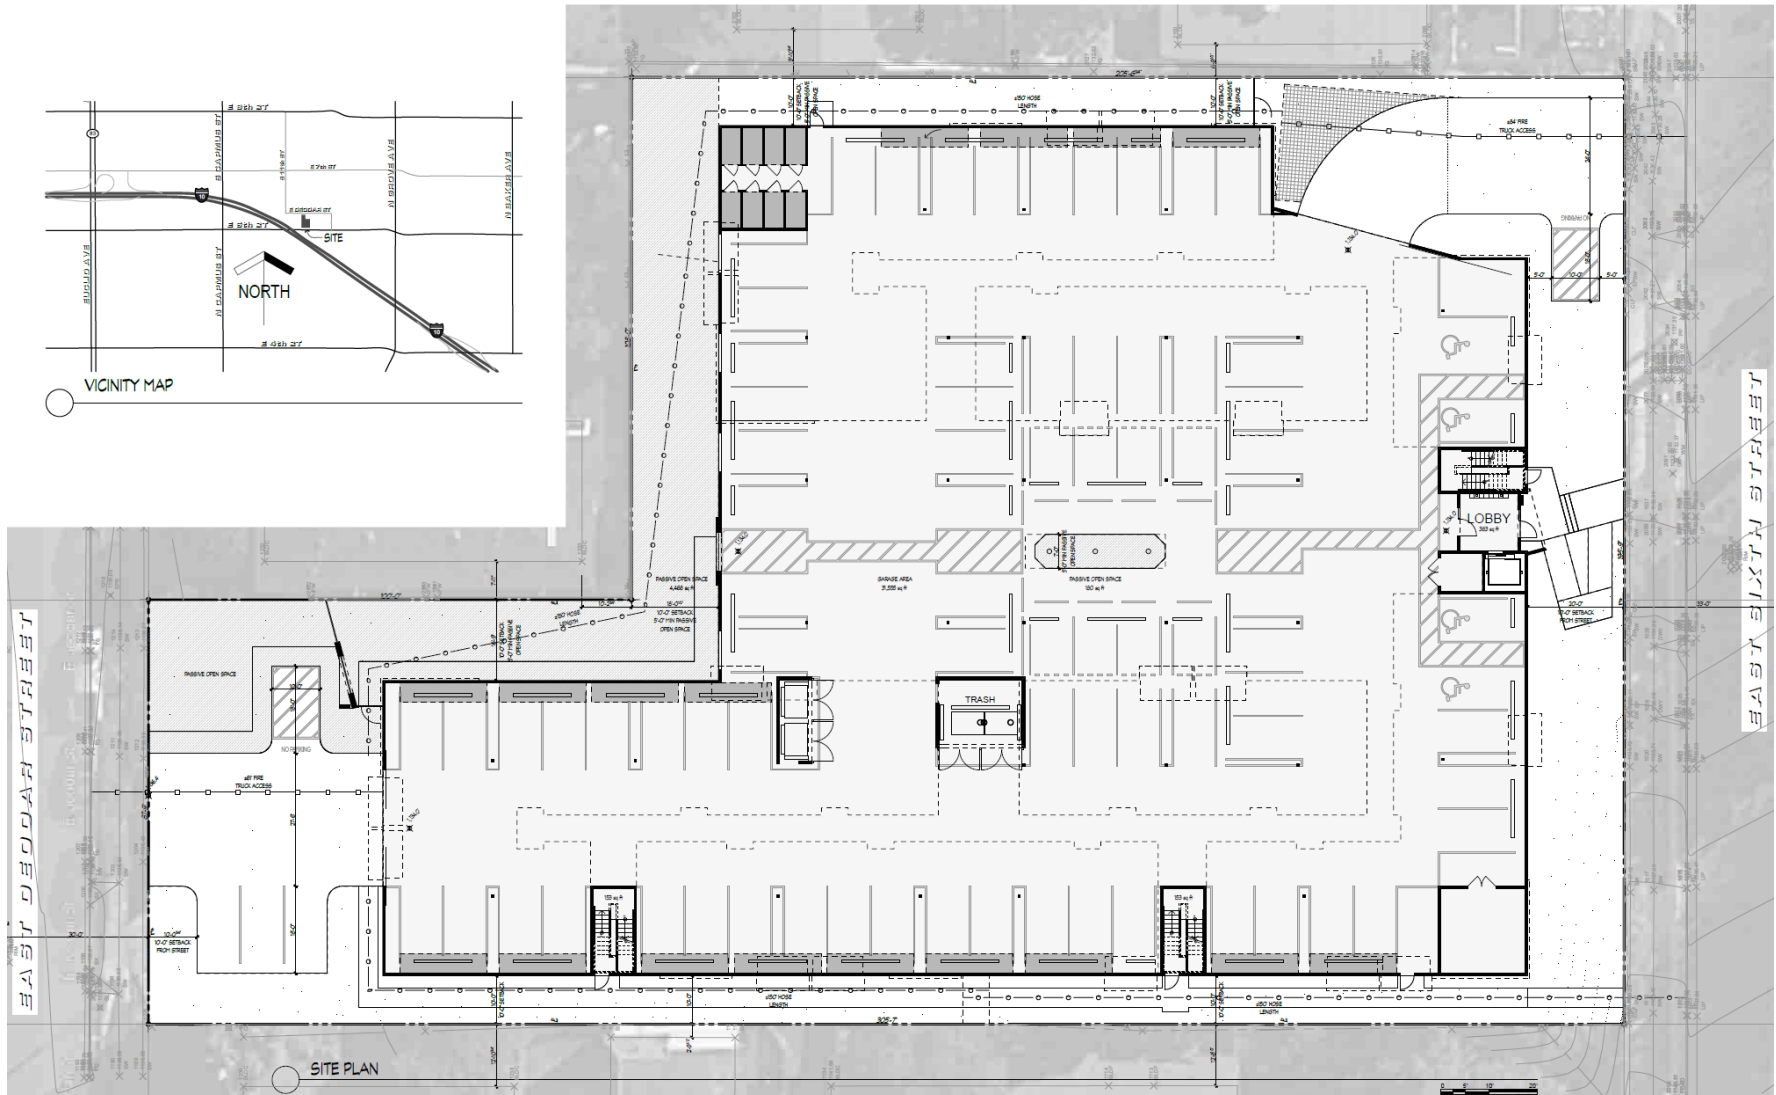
FLOOR PLAN—PODIUM LEVEL (SECOND LEVEL)
